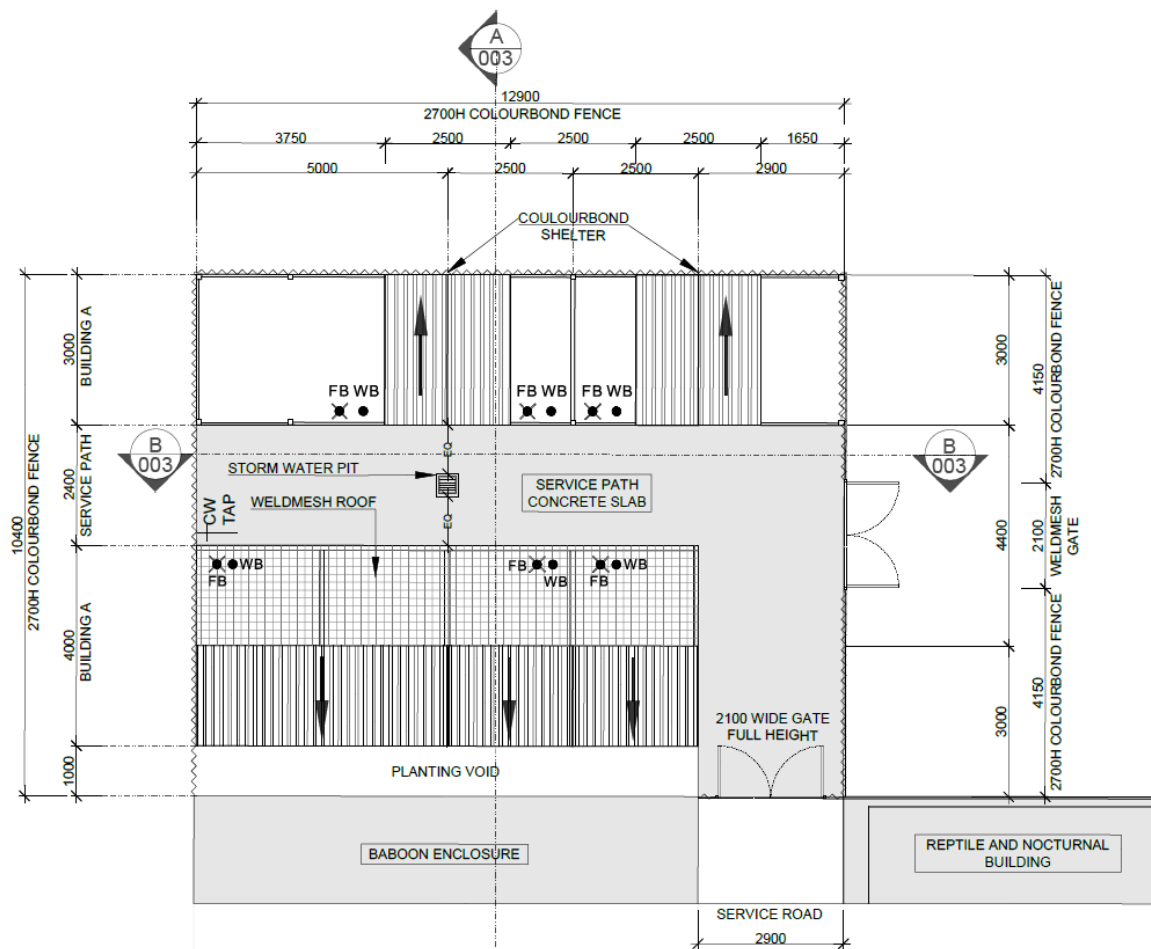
| Proposed Back-of-House Sheds – Floor Plan
